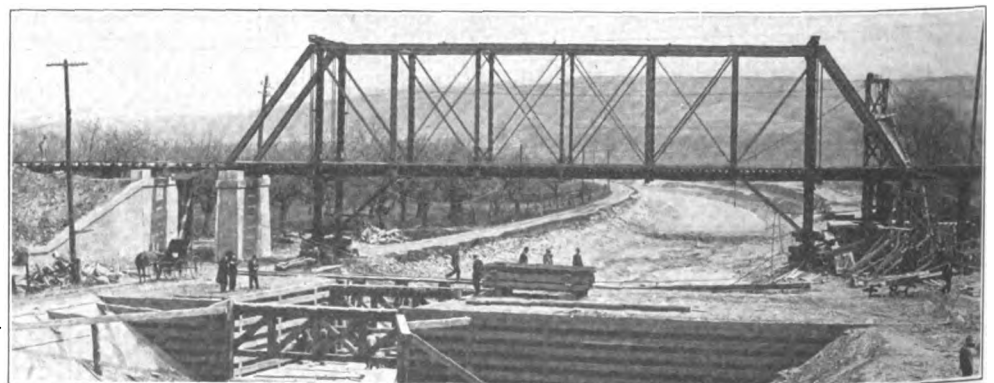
View of Pratt-Truss Span During Reconstruction of Abutments—Note Manner of Supporting Span.
